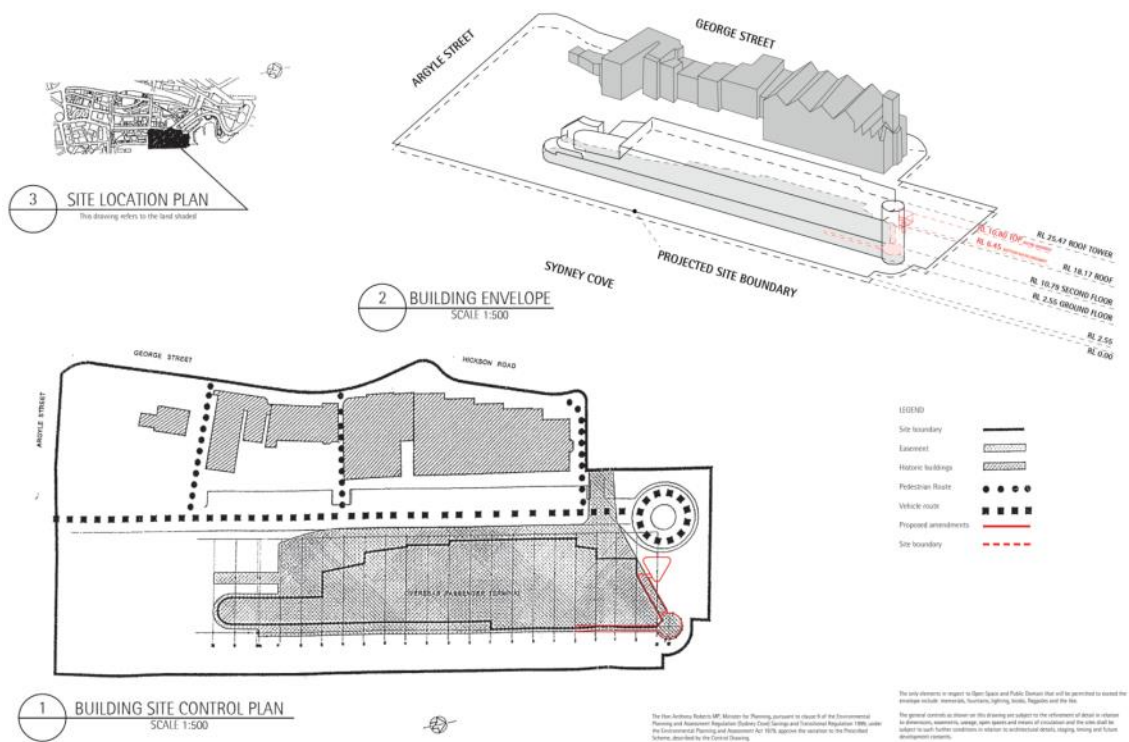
The existing SCRA Scheme Building Site Control Drawing (Source: SSD 7683)
